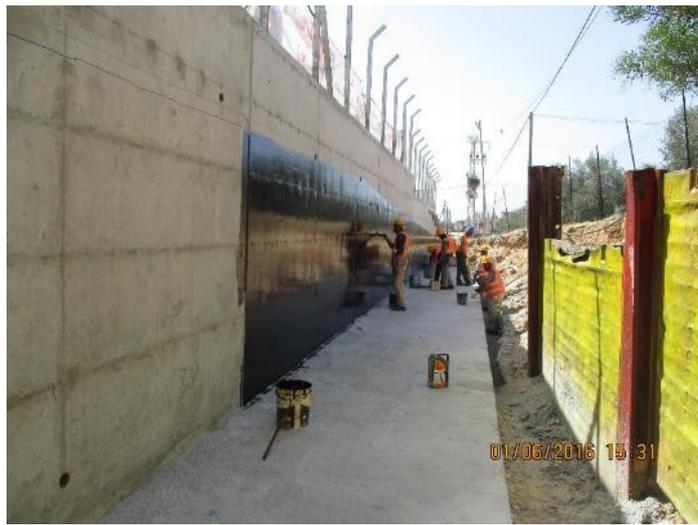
(Furnish the Primer Layer for Walls and Footings.)
